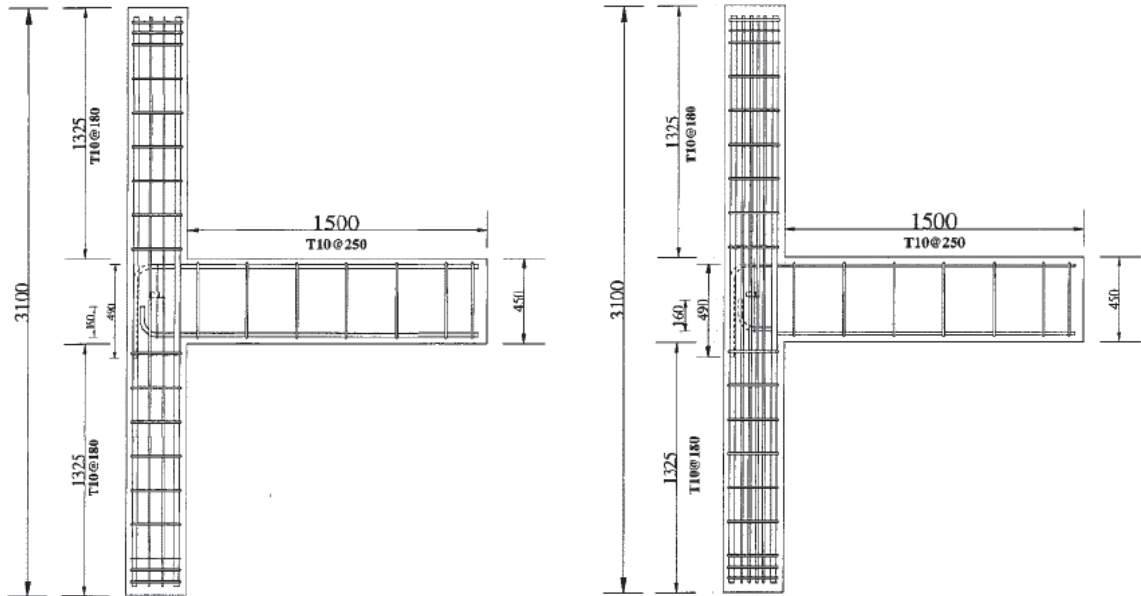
Details of exterior BCJ with column intermediate reinforcement [18]
